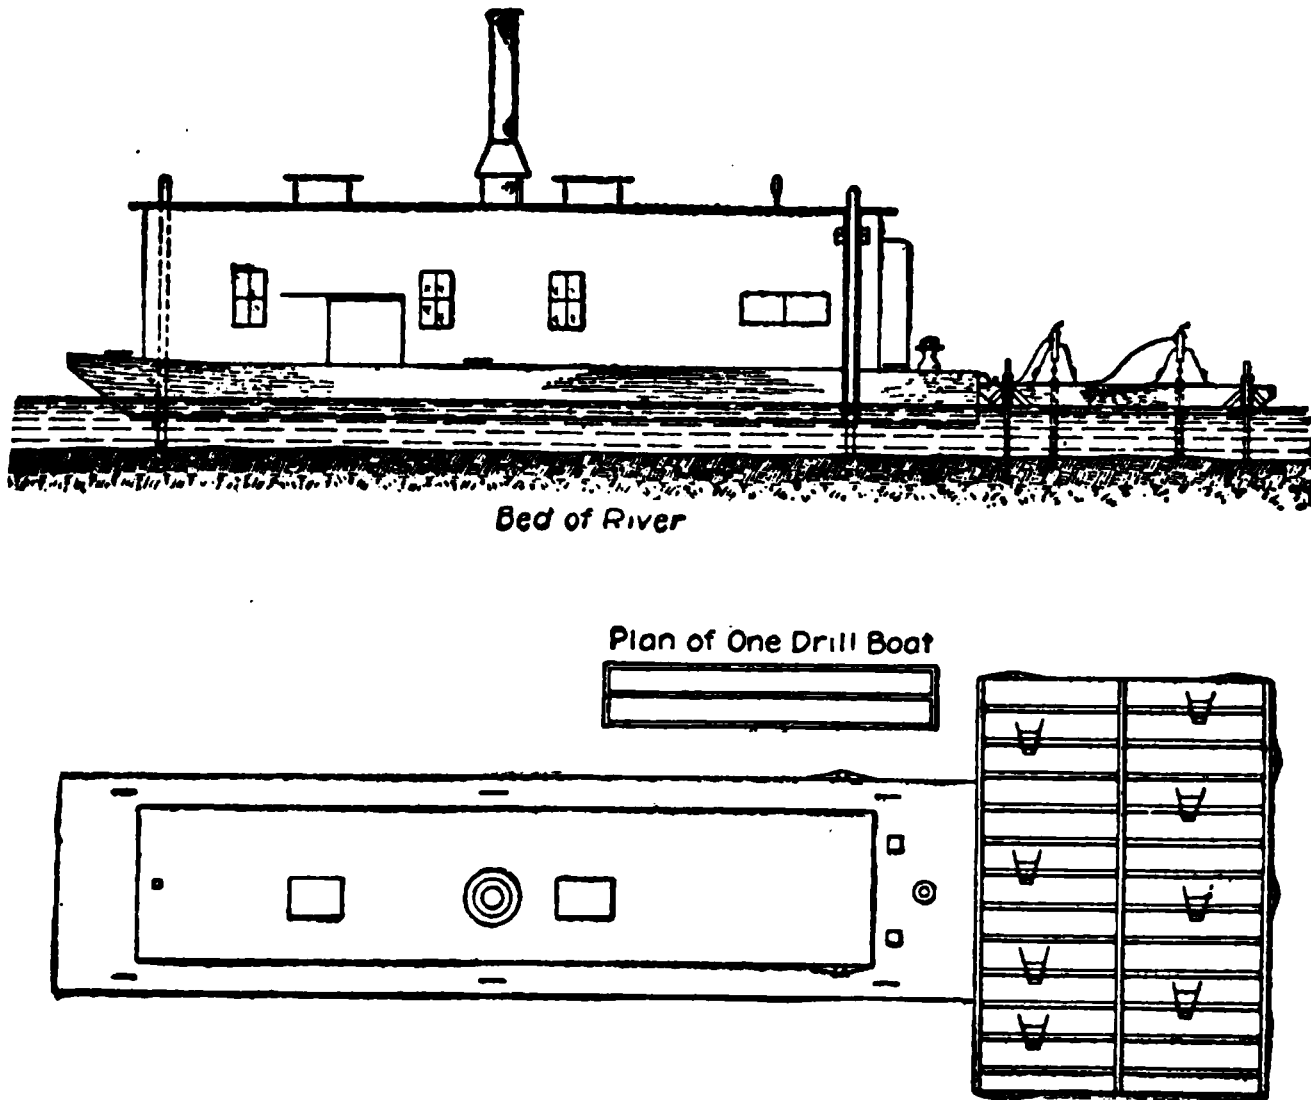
Plan and Elevation of Drill Float and Tender, Tuscumbia Bar, Tennessee River.
